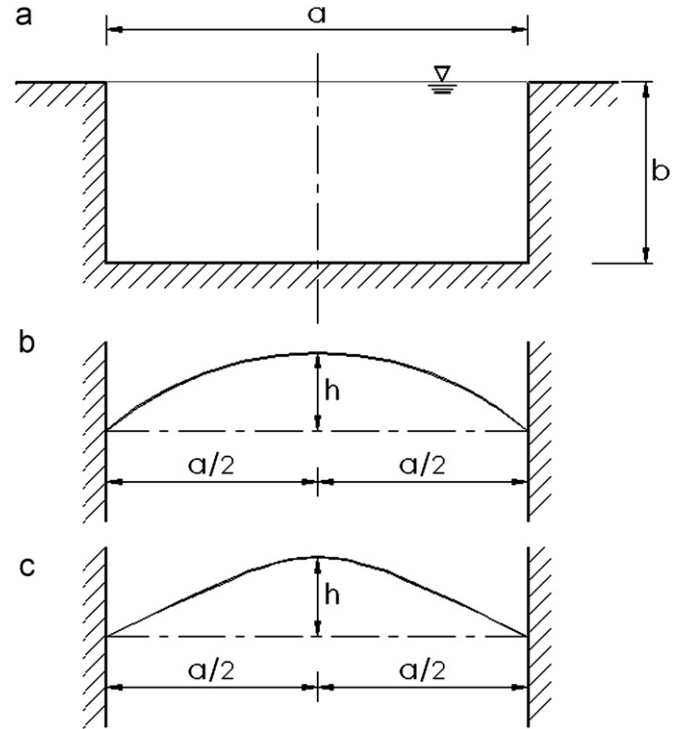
Horizontally-curved arch dam in a rectangular valley: (a) front view (projection on a vertical plane); (b) plan view (circular arch); (c) plan view (parabolic arch).
